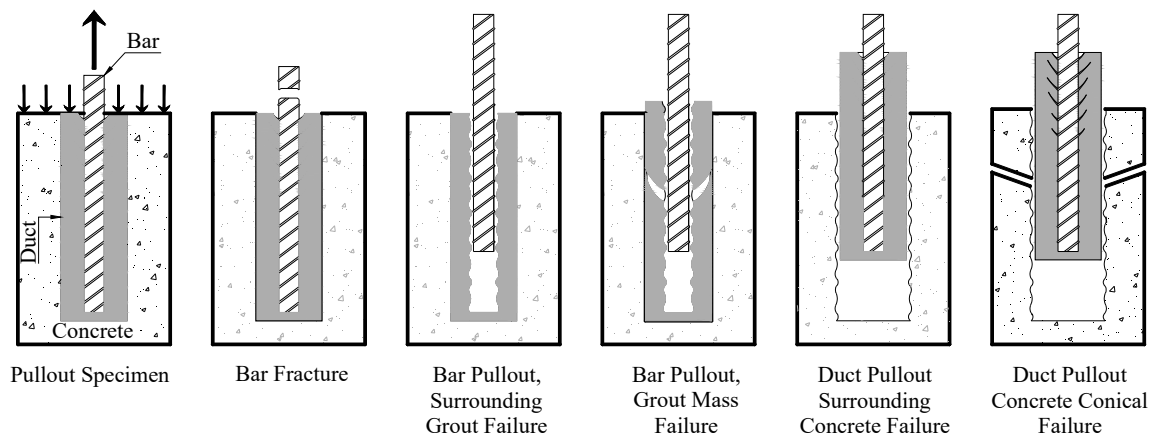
Modes of Failure in Grout-Filled Duct Connections
